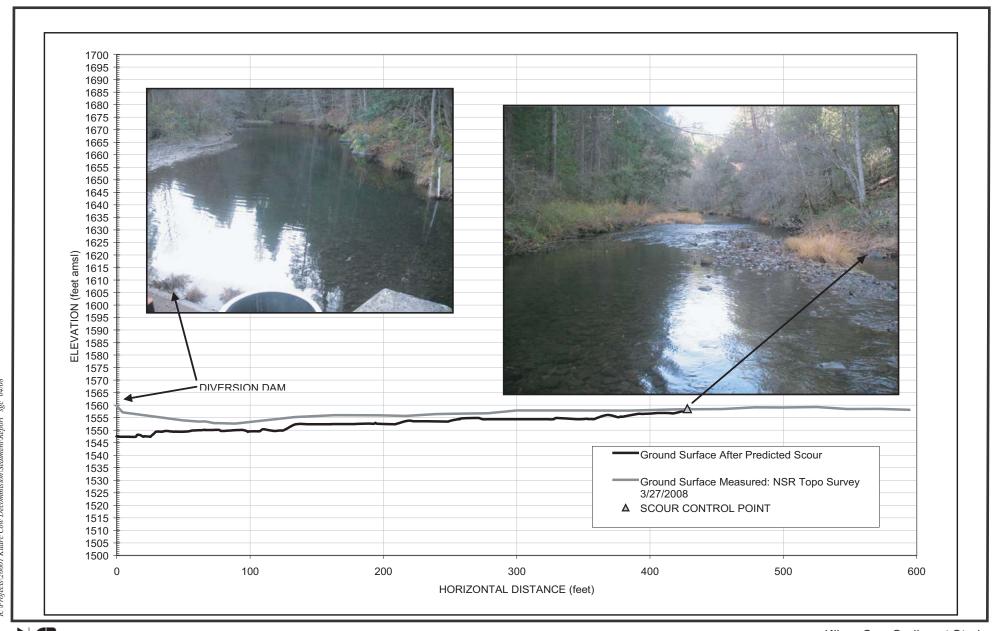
Longitudinal Profile Showing the Present Thalweg Elevation and Potential Elevation After Scour
